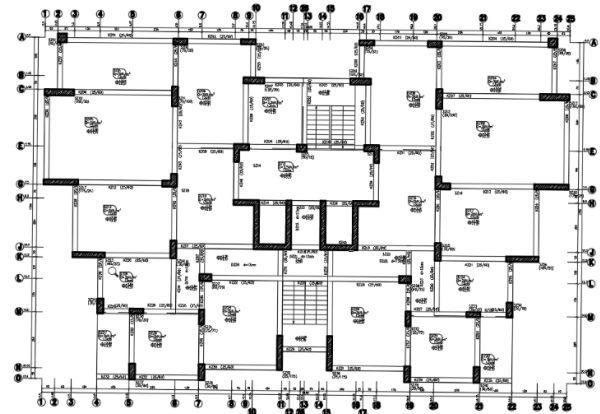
Elevation and Structural Design of the 4-Story Steel Building
